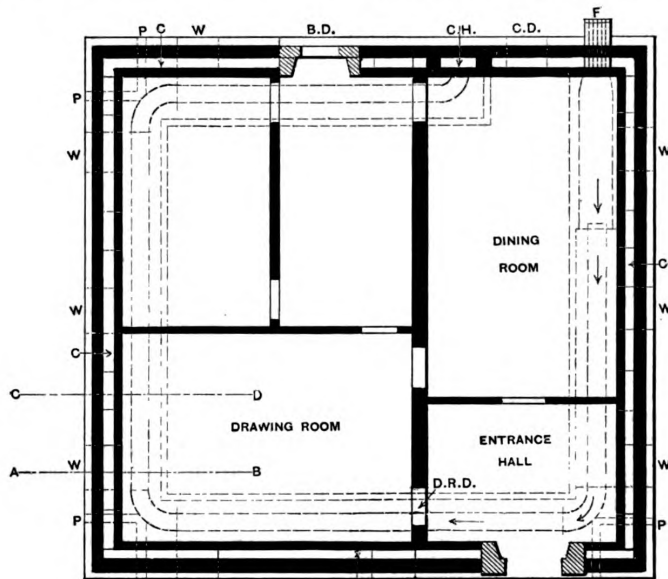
Plan of Ground Floor of House of M. Somesco.
